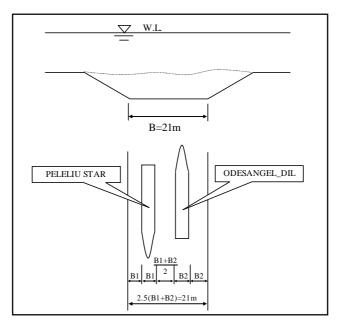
(2)-6 Examination of Width of the Access Channel
